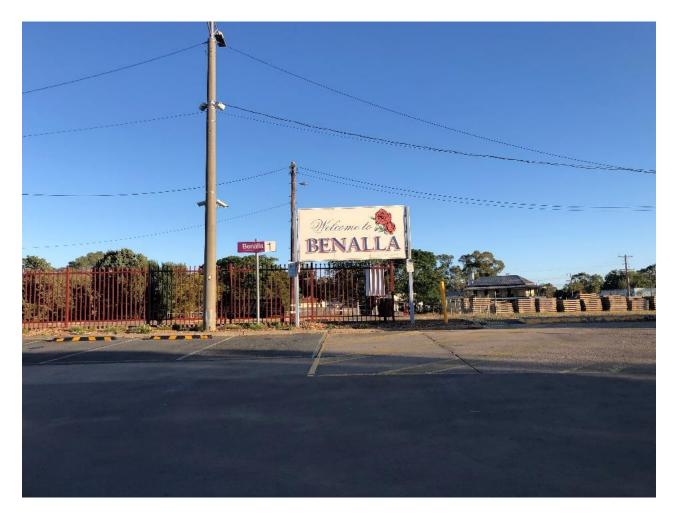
Activity Area at Benalla Railway Station facing north-west (Source: EMM)
